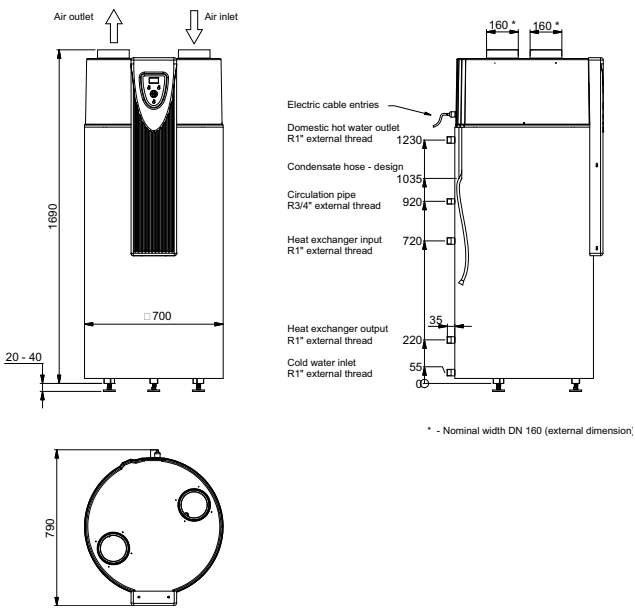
Connections and dimensions of the BWP 30HLW domestic hot water heat pump equipped with an additional internal heat exchanger
